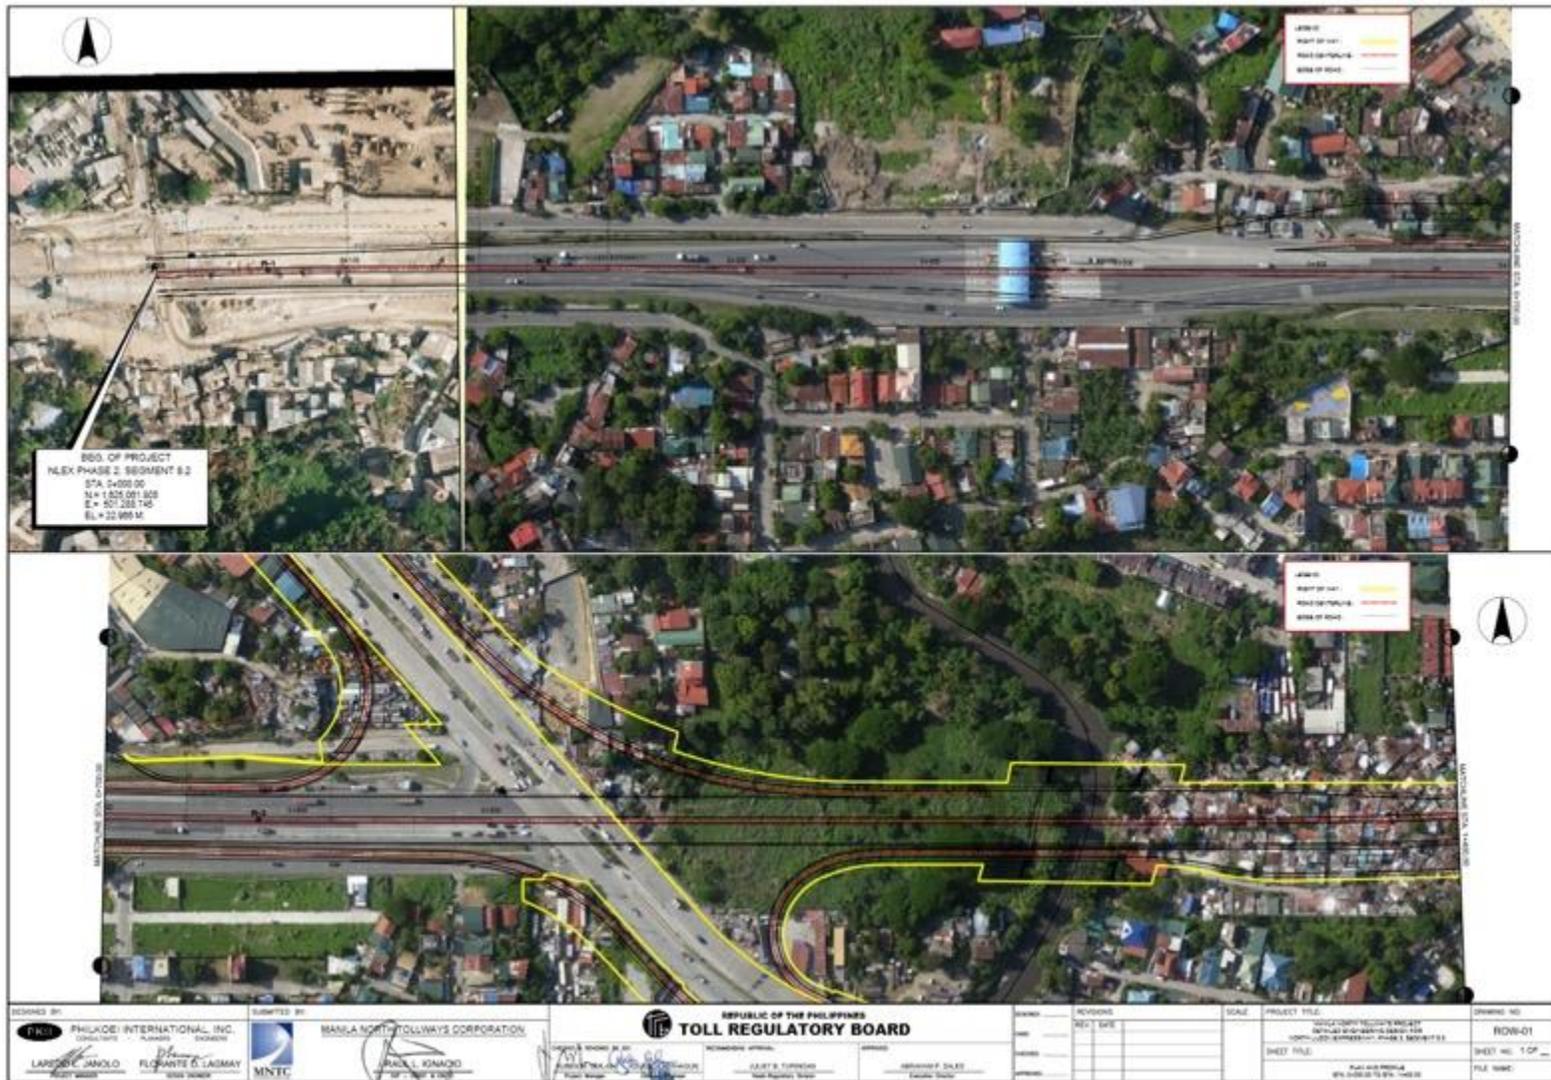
Alignment Section 1 (Mindanao Avenue to Congressional Avenue), STA. 0+000.00 To STA. 1+400.00.
